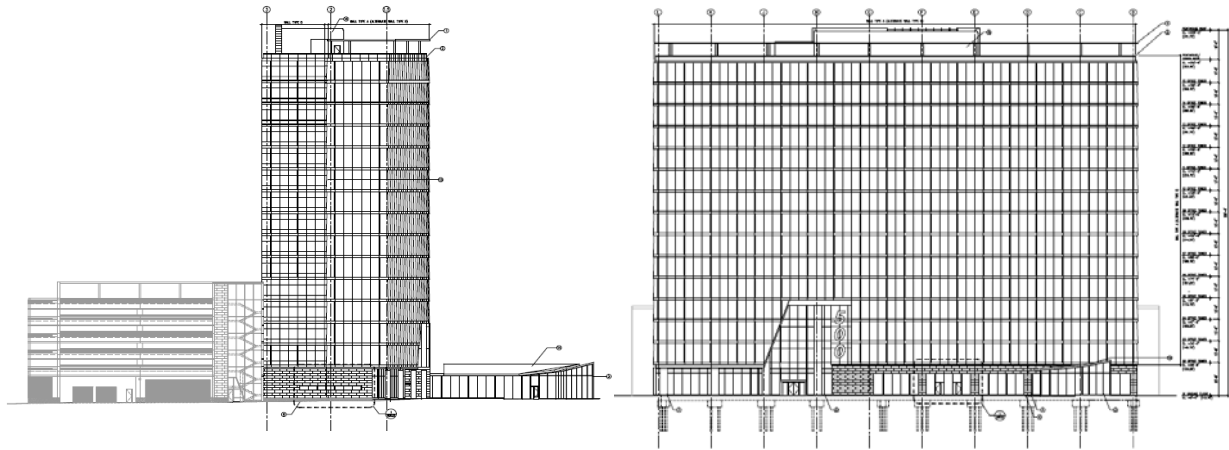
Front of side elevations of the office tower and parking garage. (Drawings courtesy of Gensler)
